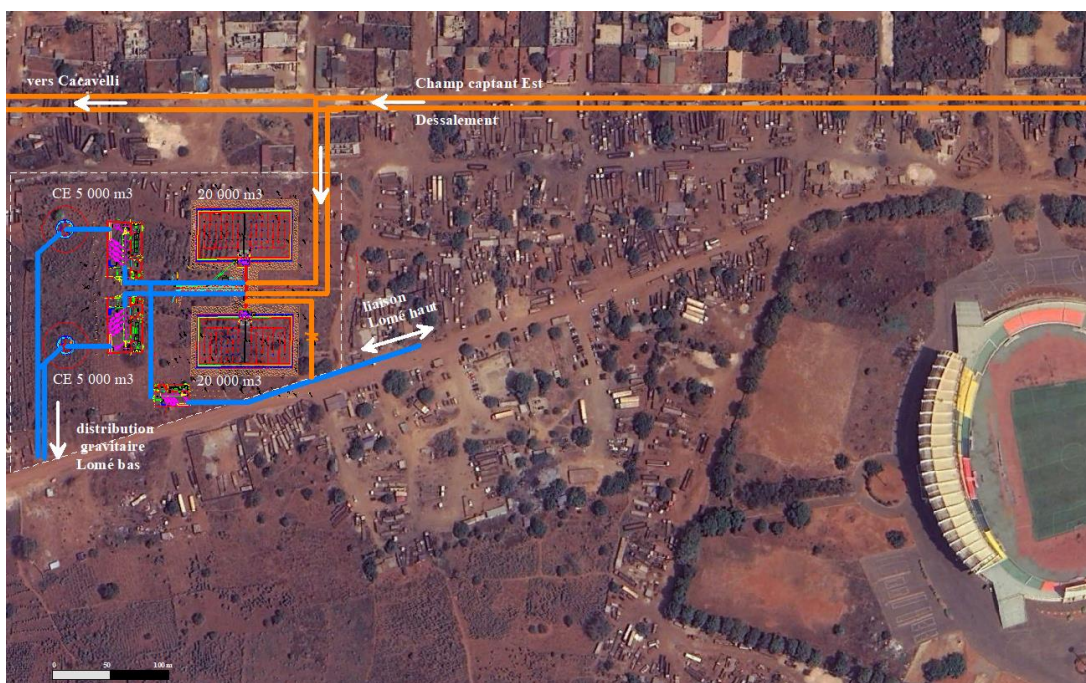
Planned installations - Site of the bd du 30-août (~45,000 m2)
